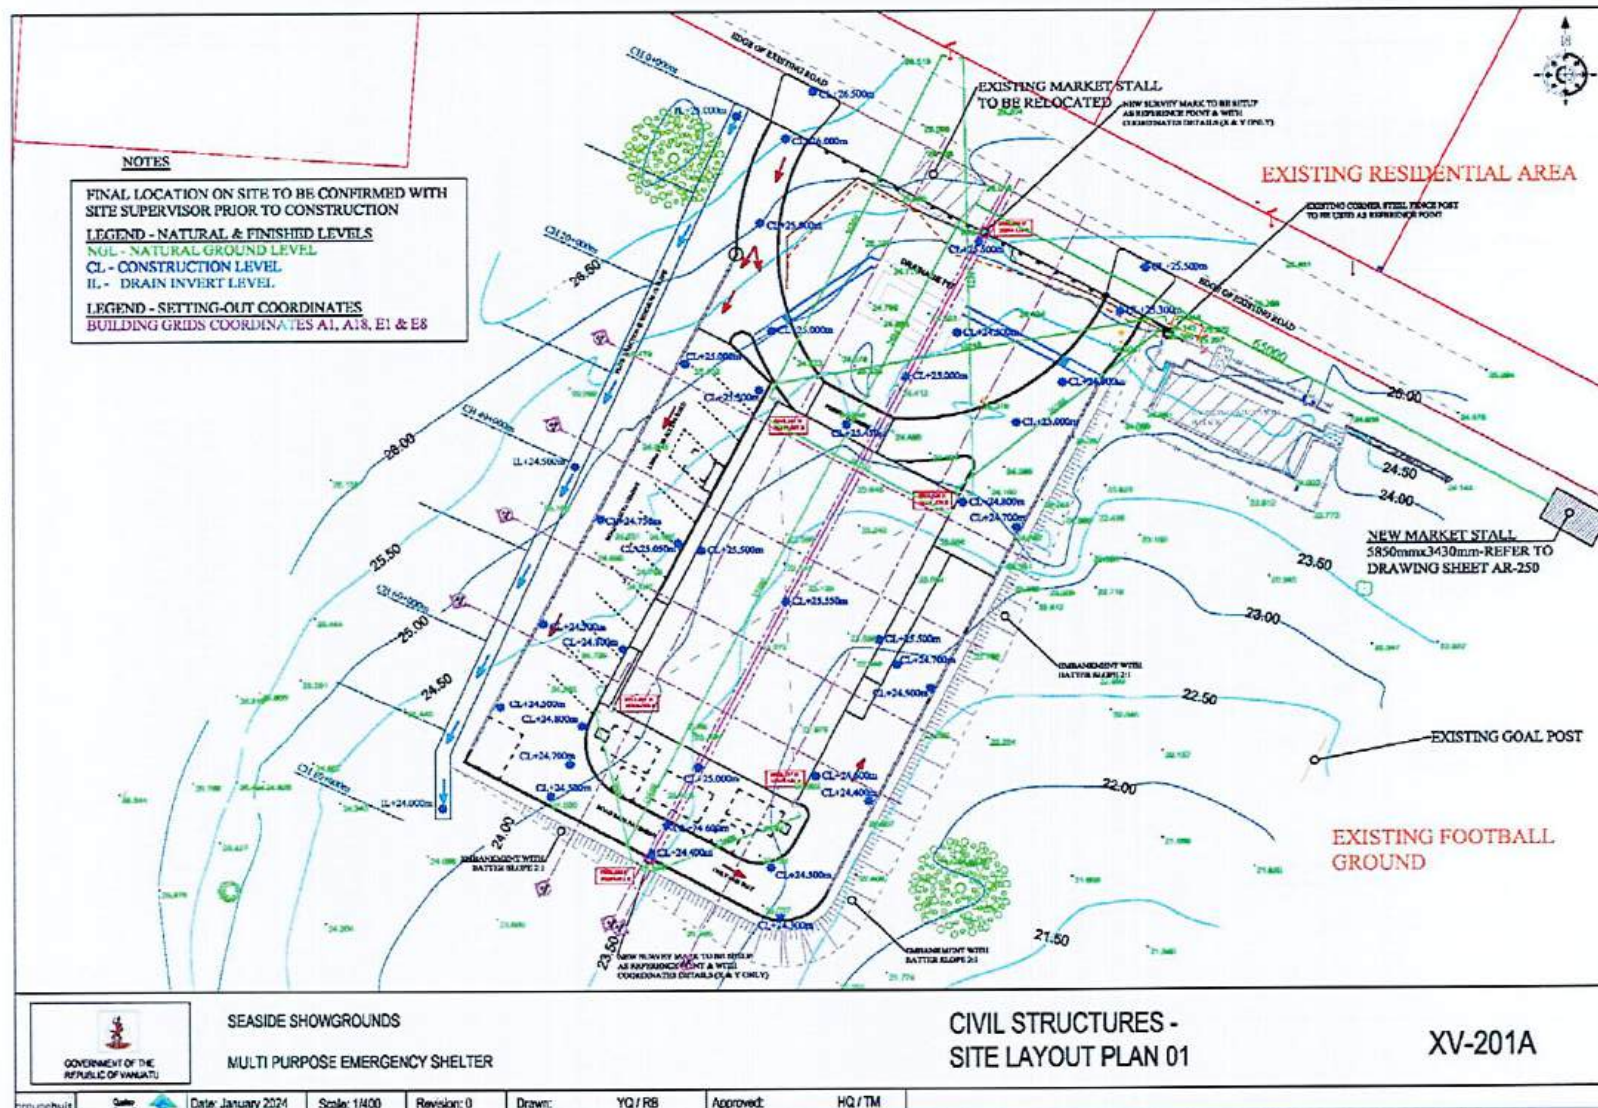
Seaside Showground - Civil structure site setout plan showing the main elevation of the construction
